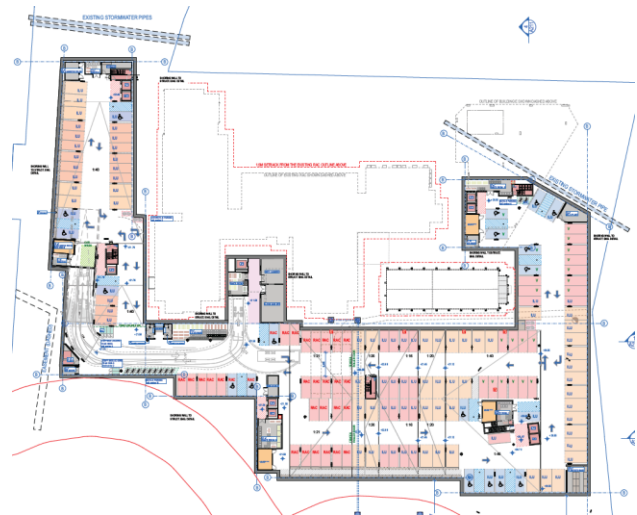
Basement Floor Plan (as amended in RtS and Amendment Report 2)
